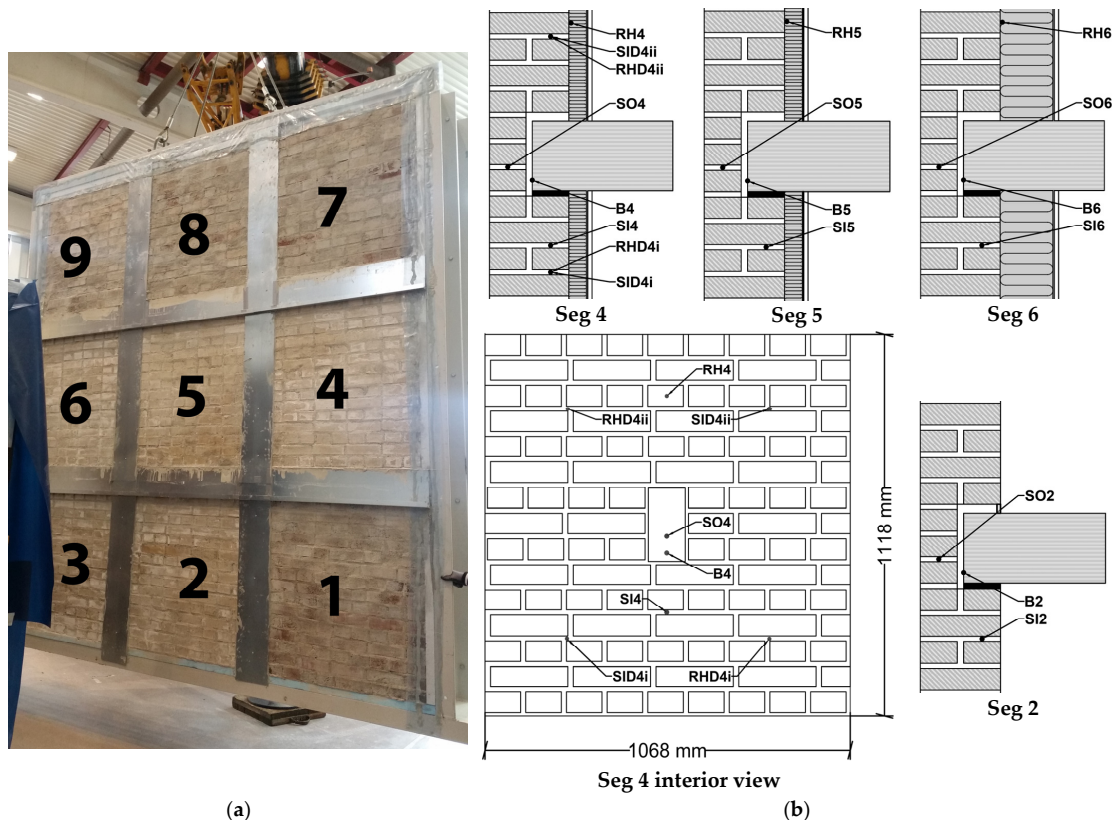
Test wall. (a) Exterior face with flashings/gutters mounted. Each segment numbered. (b) Cross-sectional overview of the four wall segments, including sensor locations.
